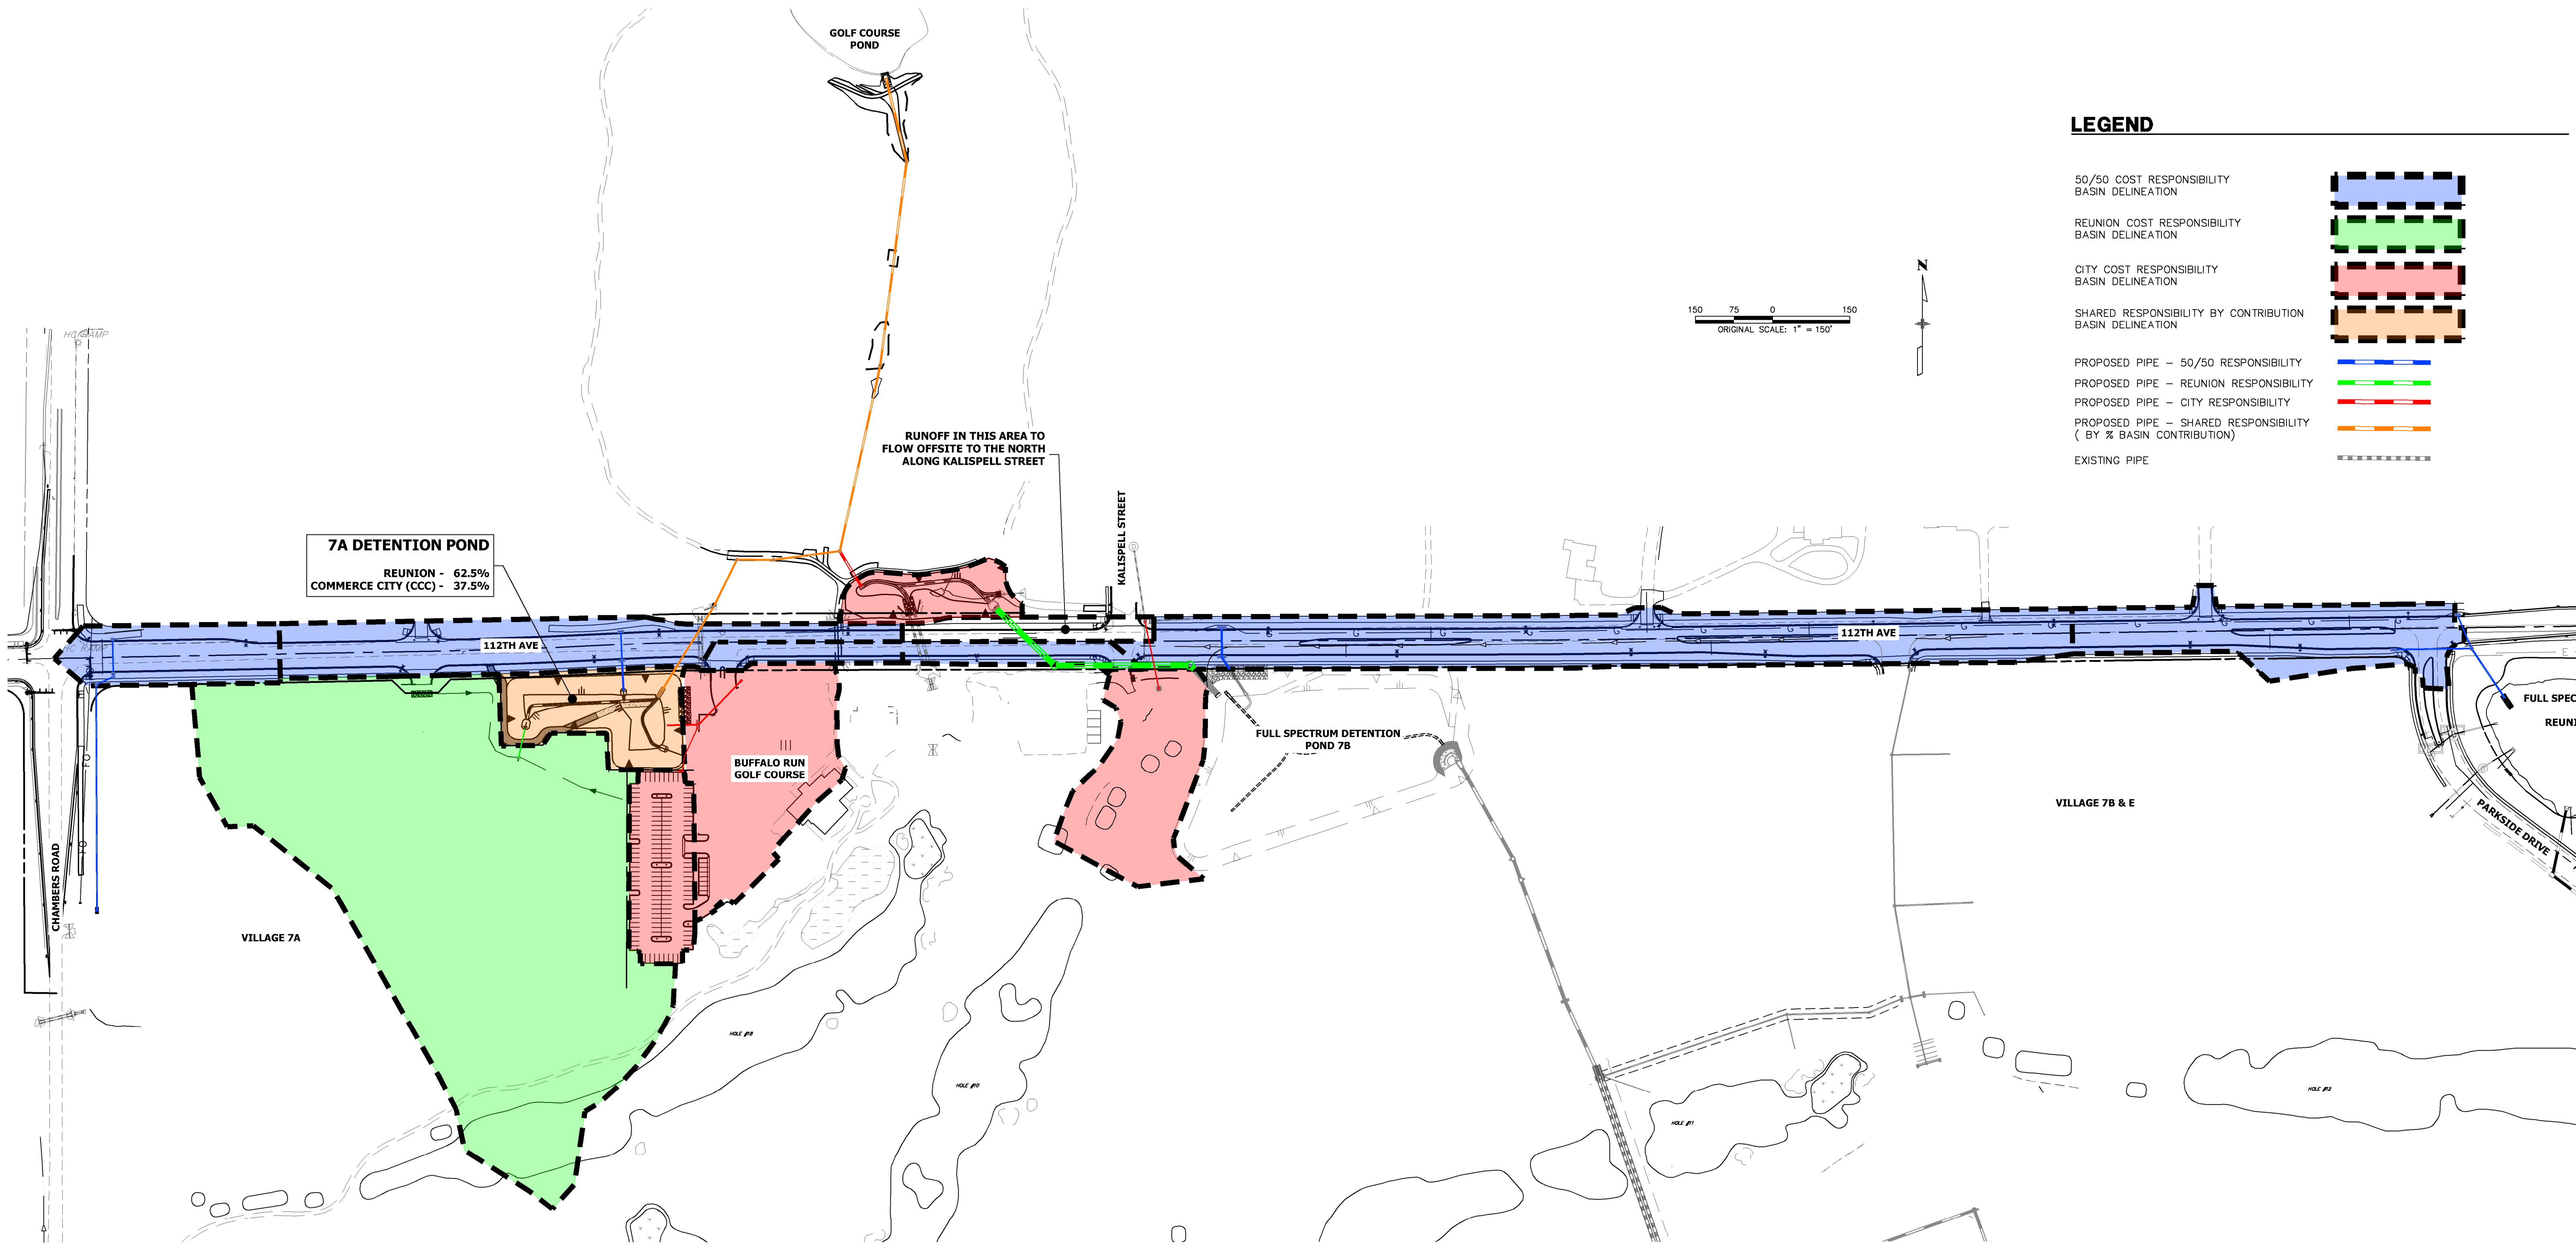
Drainage Basin Contribution Calculation for Pond and Outfall
